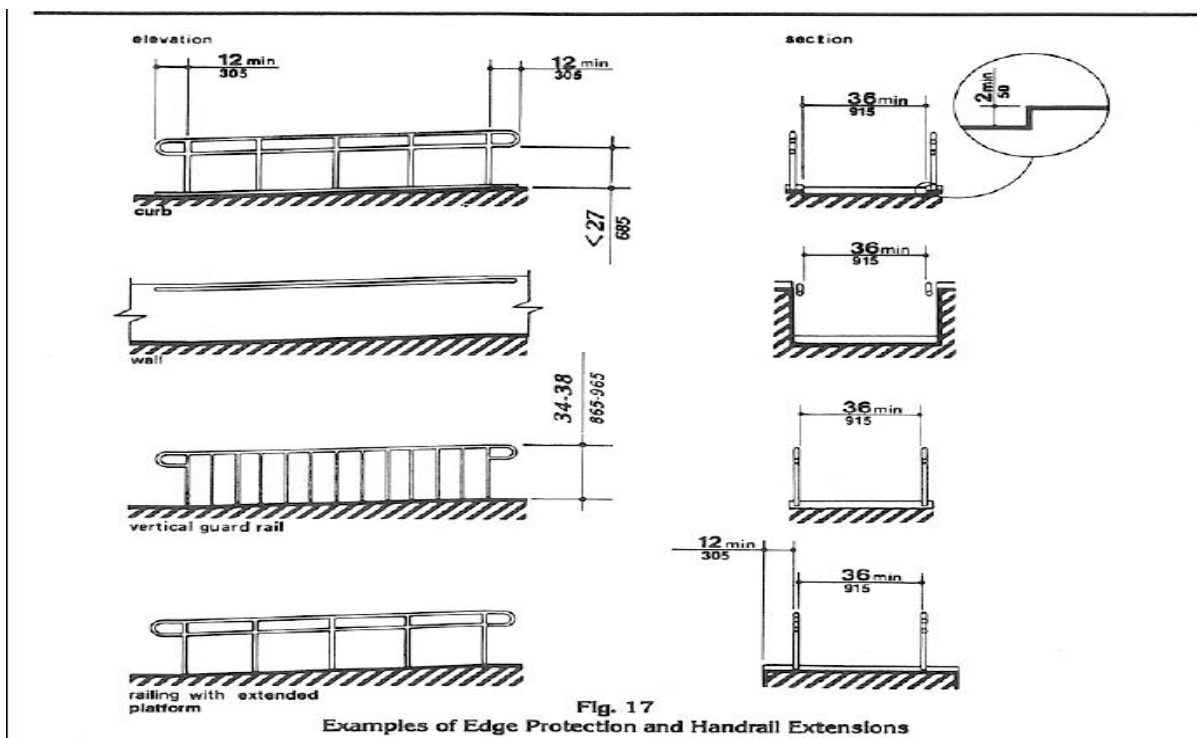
Examples of Edge Protection and Handrail Extension (ADA 2010 standards)
